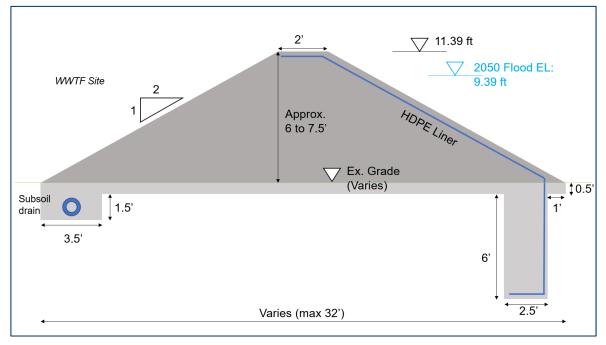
Option 1, Perimeter Flood Barrier Concept Arrangement, Plan View
